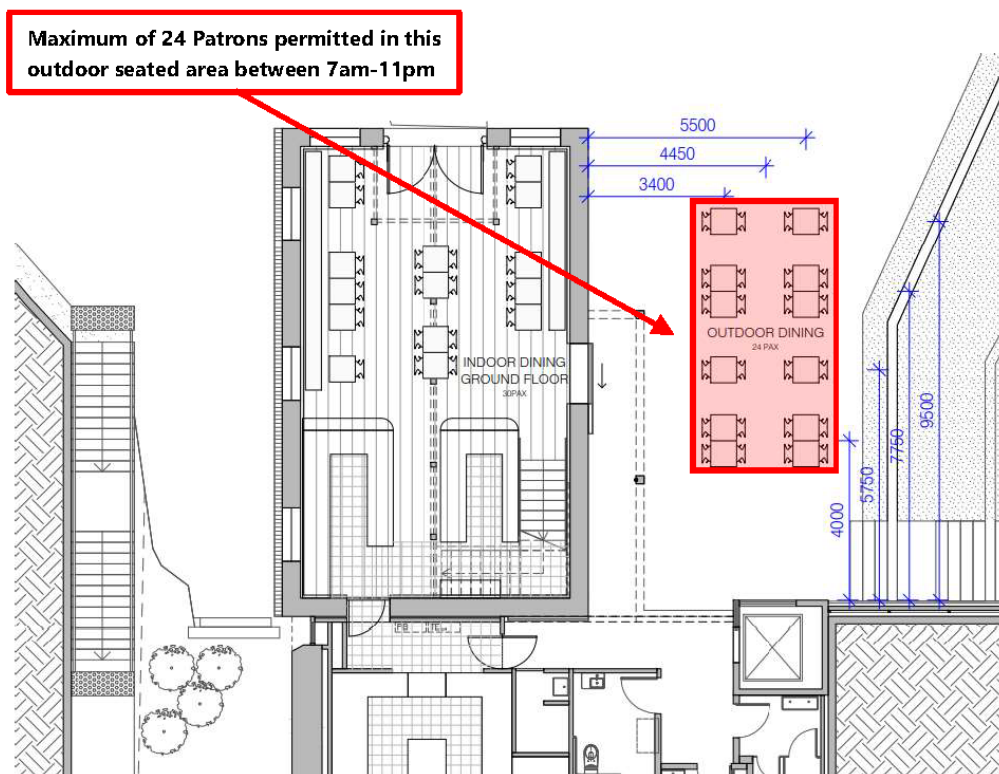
Restrictions for Ground Floor Outdoor Seating Area
